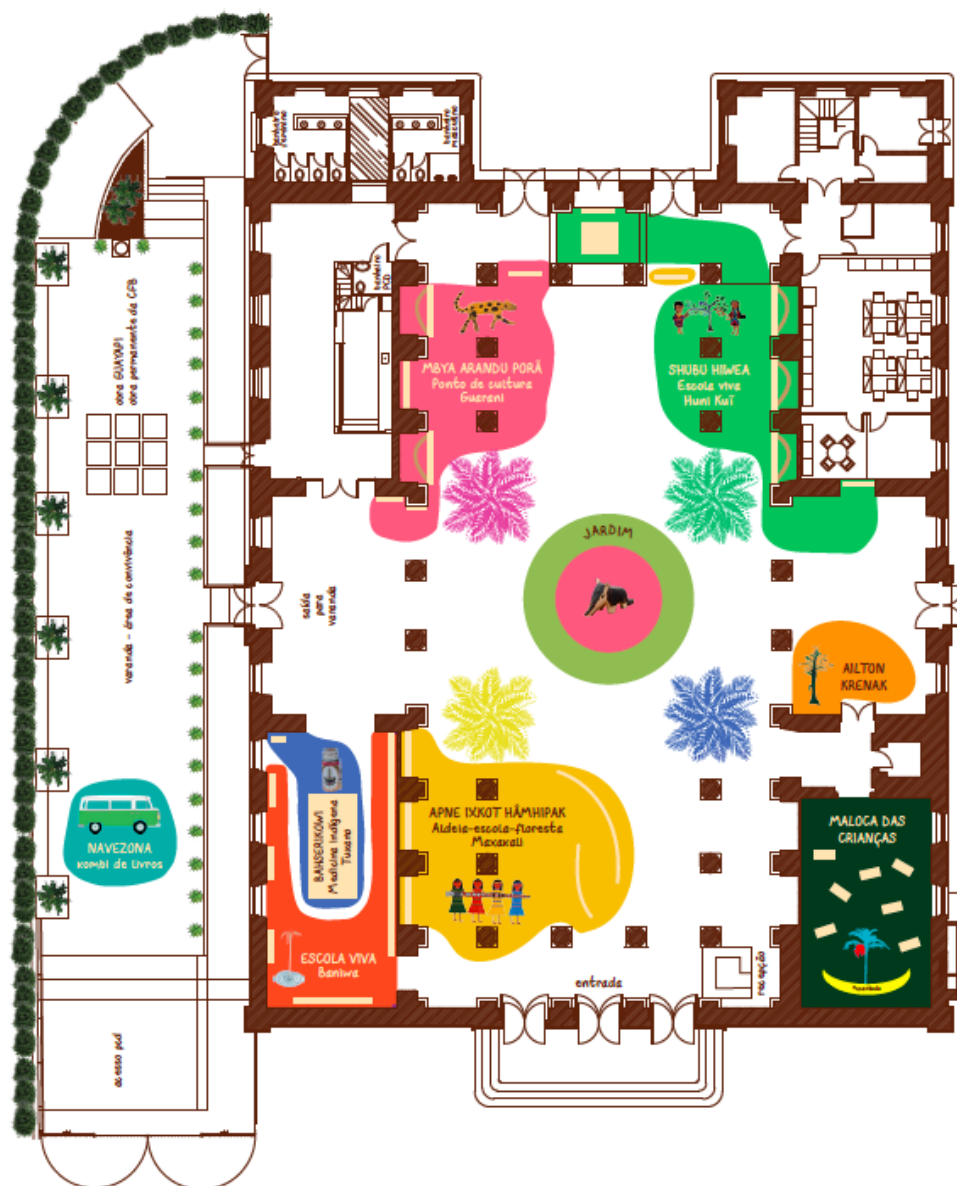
Floor plan of *Viva Viva Escola Viva* exhibition, 2023
